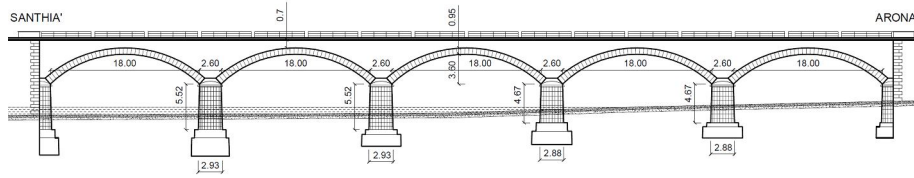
Longitudinal view of Cervo River Bridge (distances in meters).
